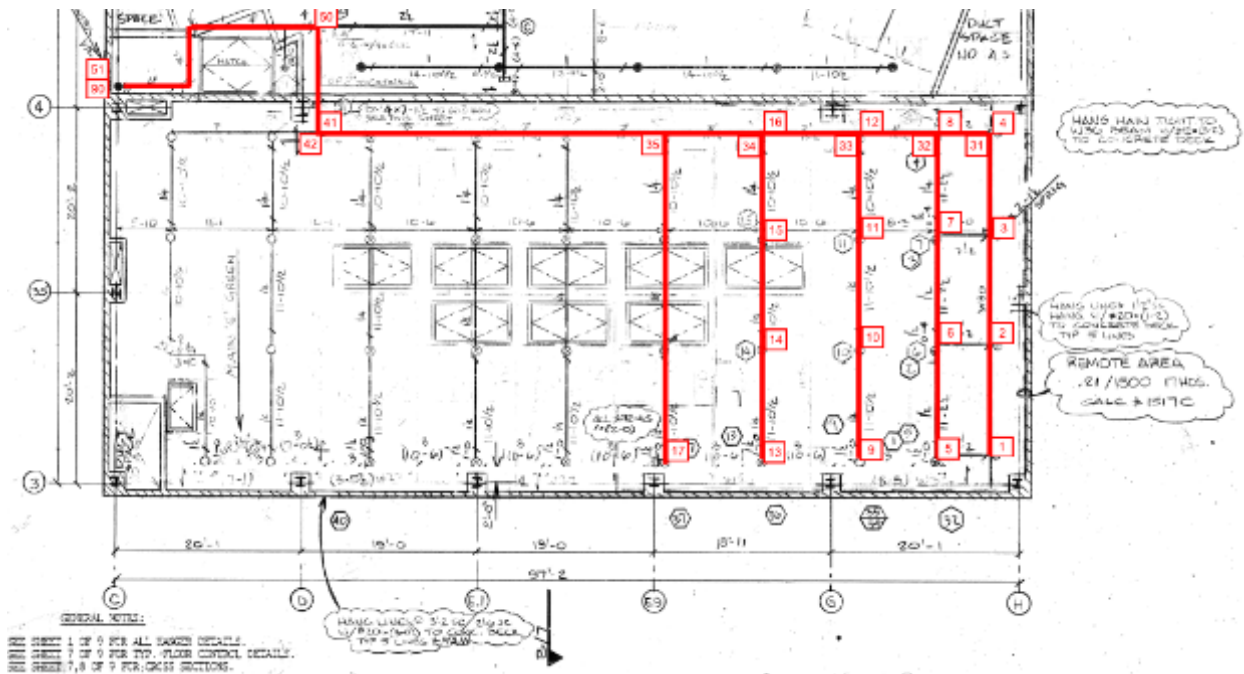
Sprinkler layout at Grid-iron level showing hydraulic nodes 1 - 90.
